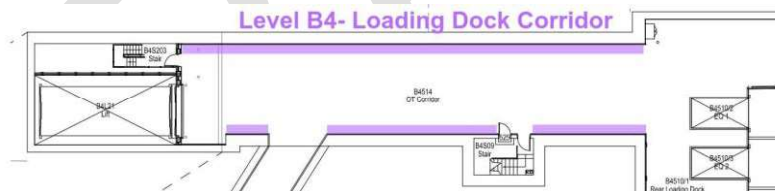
1200mm high plywood protection to B4 Loading Dock Corridor
